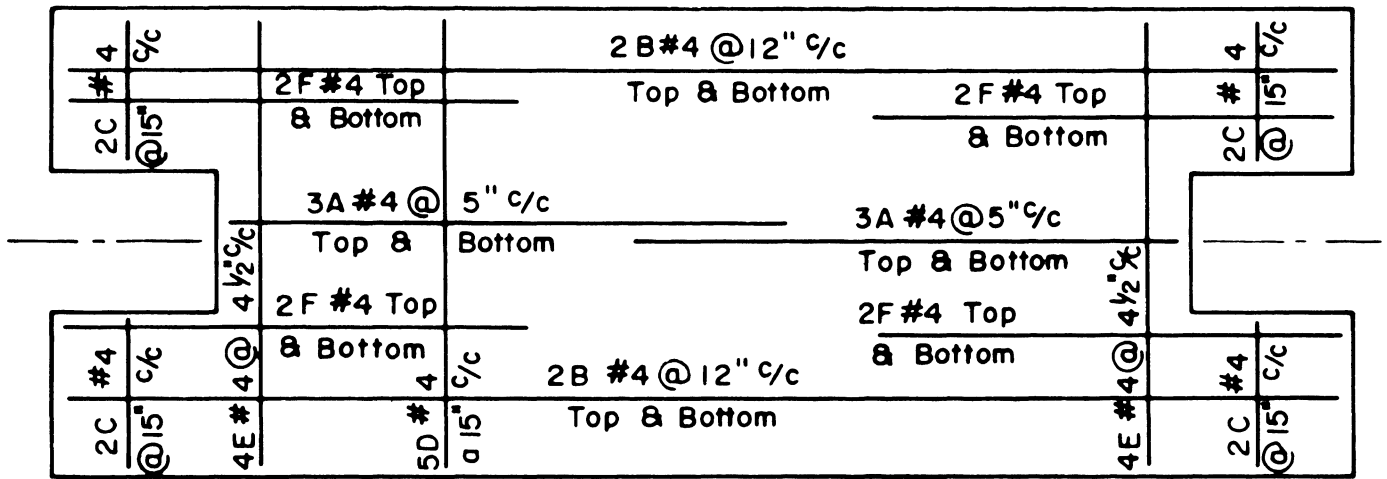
Reinforcement Details for Beams A, B, C, D, G and H
